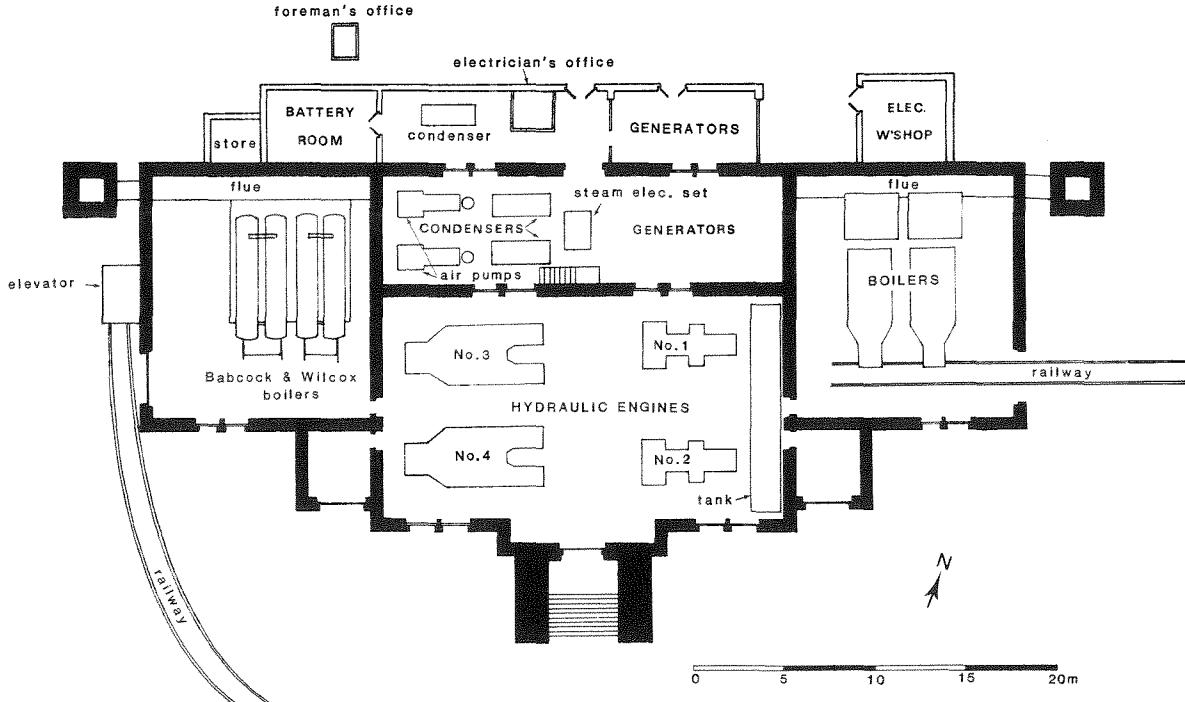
Plan of Bullock Island Hydraulic Power-House, 4th Extension, 1914. Adapted from New South Wales Railways Archives Plan No. 15915.
